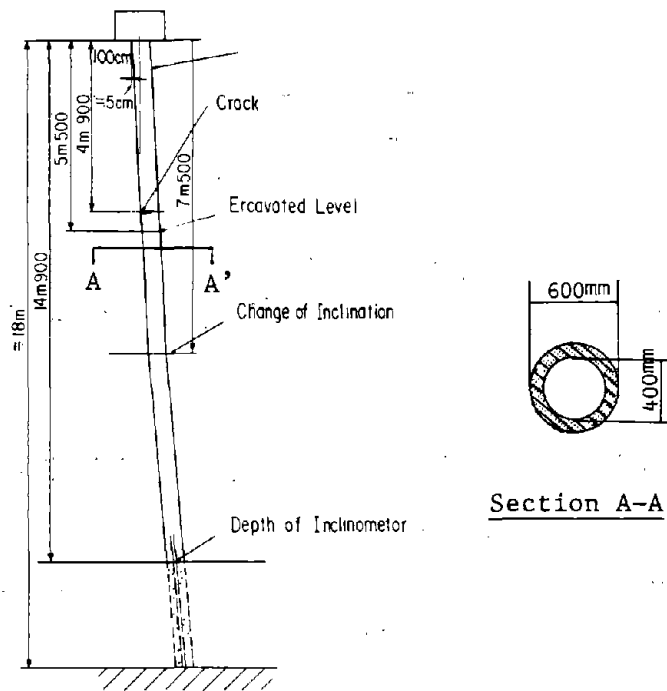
Damage to Prestressed Concrete Pile of Gaiko Warehouse
